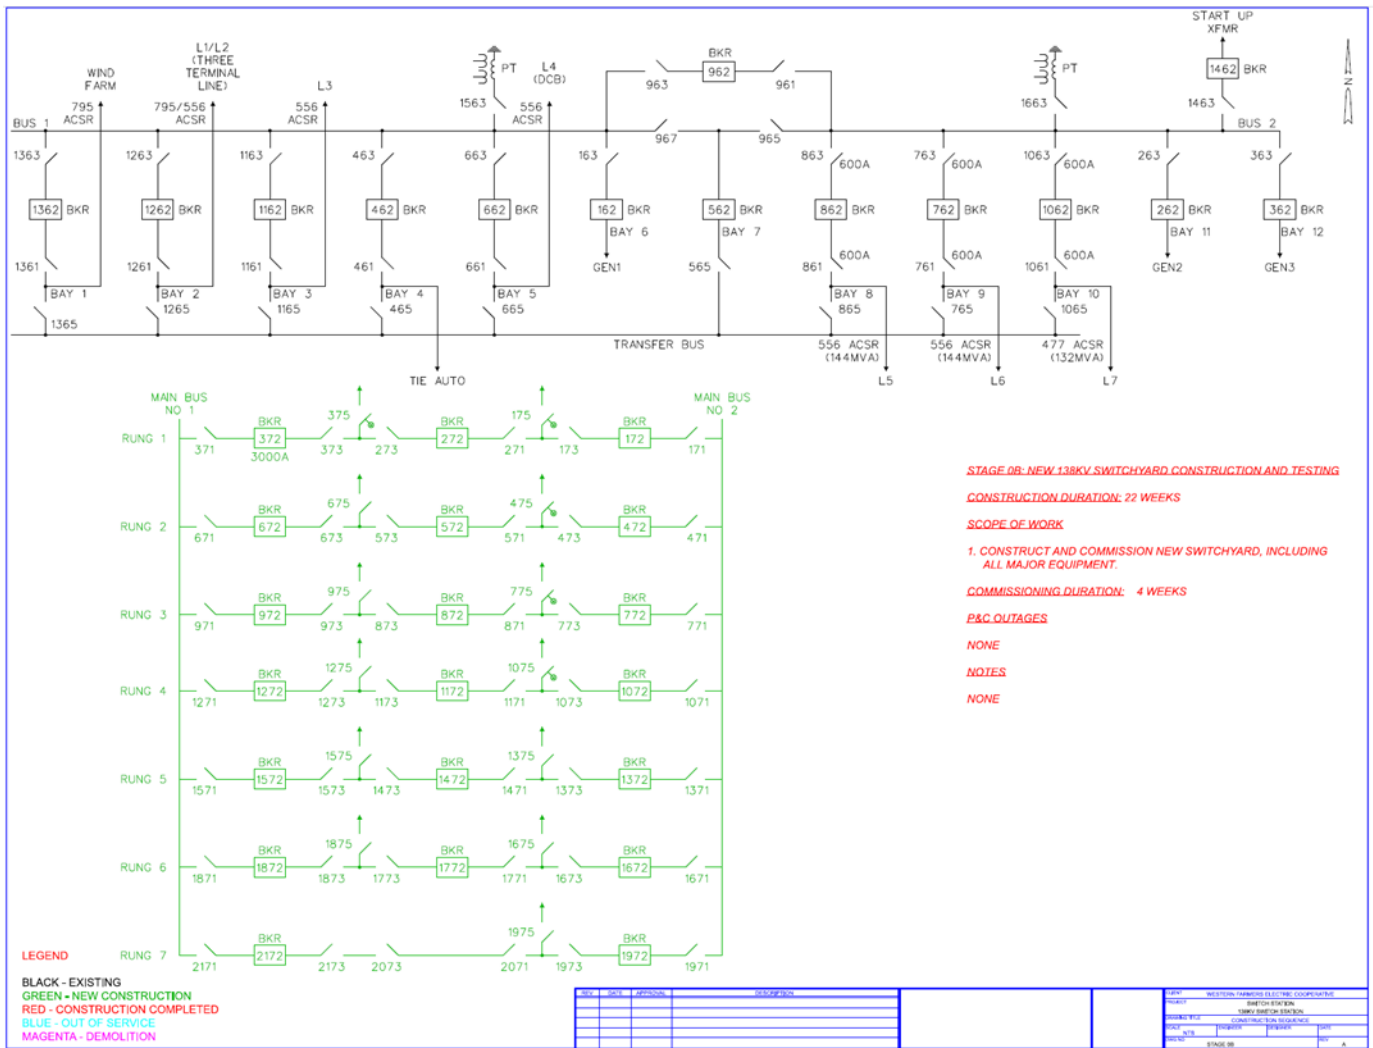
Construction sequence Stage 0B—new station construction and testing.
